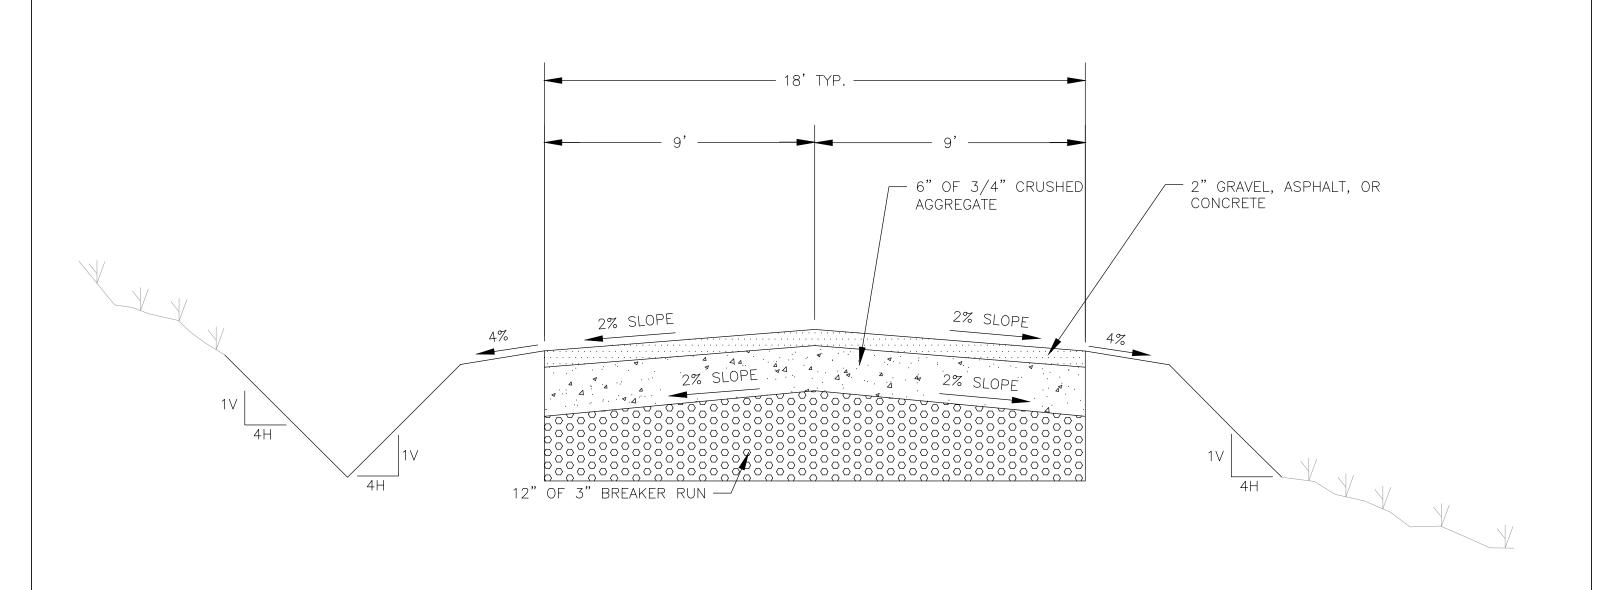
GREATER THAN 200 FEET DRIVEWAYS TYPICAL CROSS SECTION
